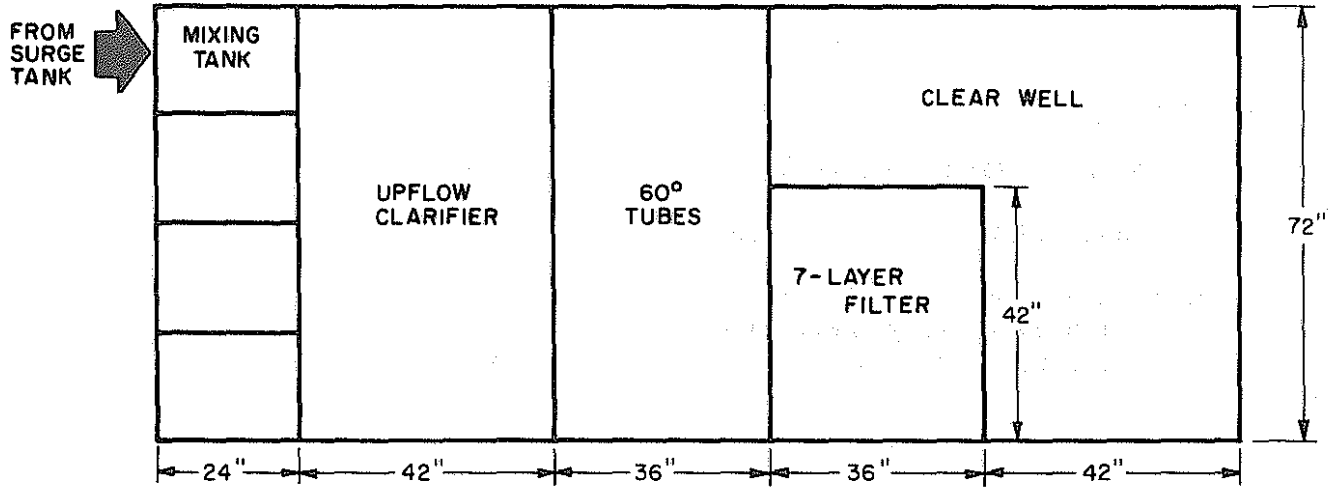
ECI MIXING, SETTLING, AND FILTRATION MODULE
